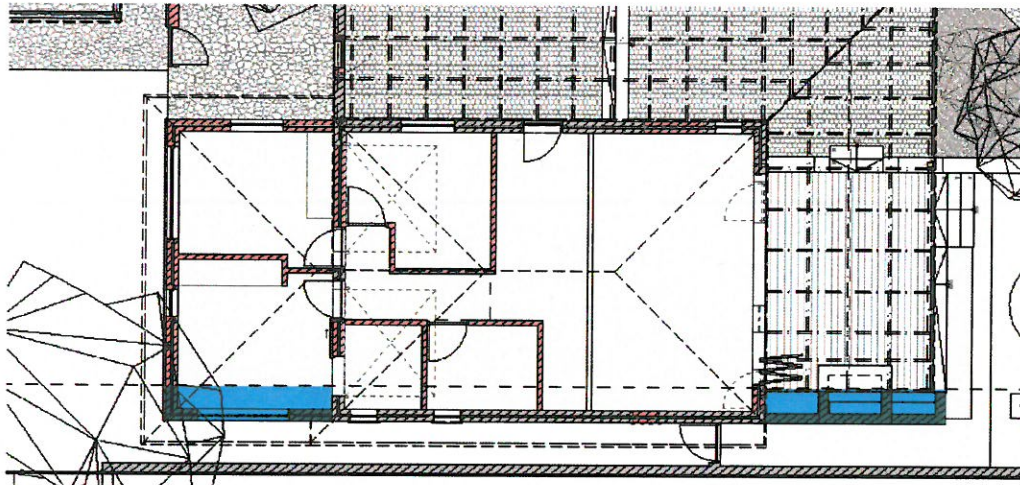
, b & c: Simplified plan excerpts showing the proposed extension of the existing dwelling and outbuilding following existing wall lines, and the position of the new carport (to follow 16.1.2(b) of the Zoning Scheme). Blue highlights are areas beyond the current building lines.
